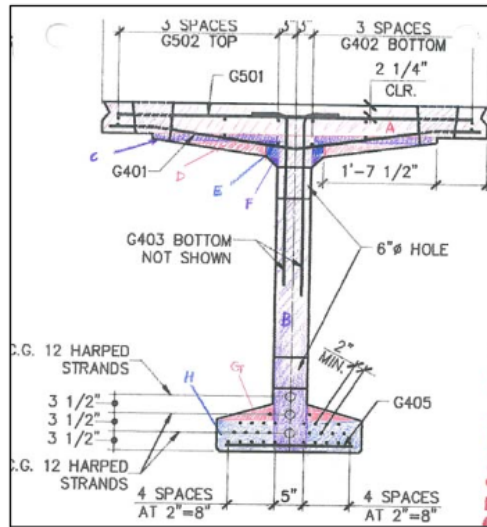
Section Properties of Tulsona Creek DBT Girder
